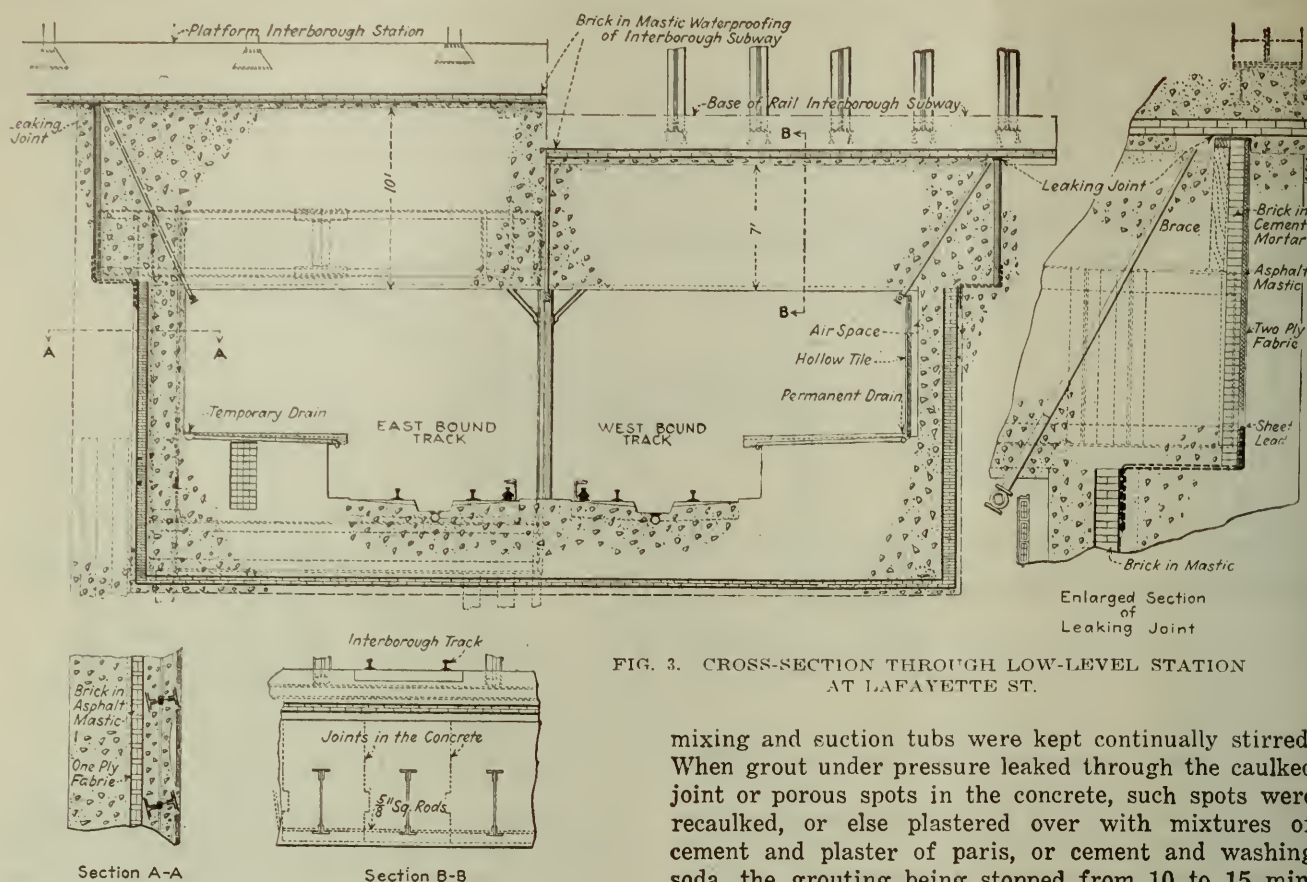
CROSS-SECTION THROUGH LOW-LEVEL STATION AT LAFAYETTE ST.
